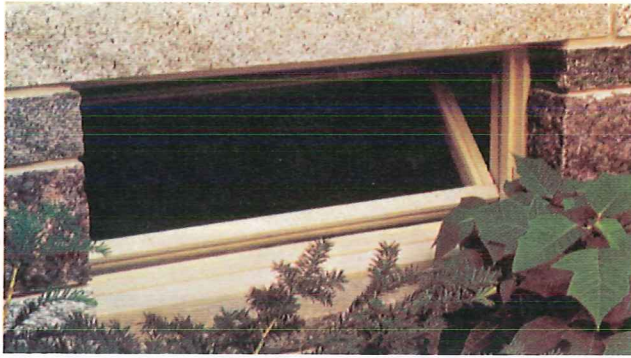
Hopper windows are popular for basement applications. (Andersen Corporation)
